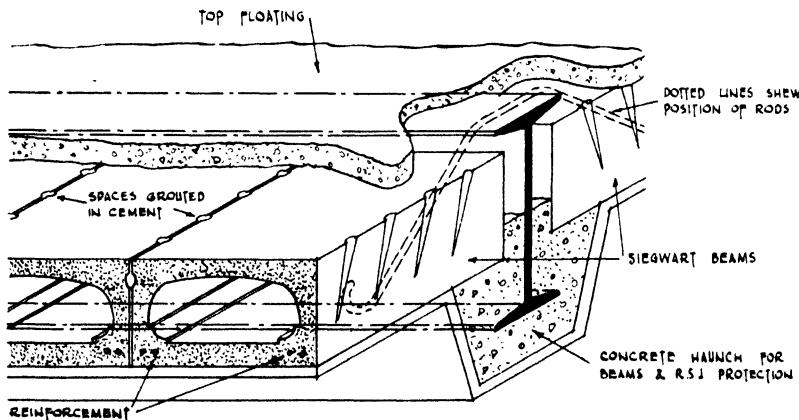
SIEGWART PRECAST CONCRETE FLOOR
